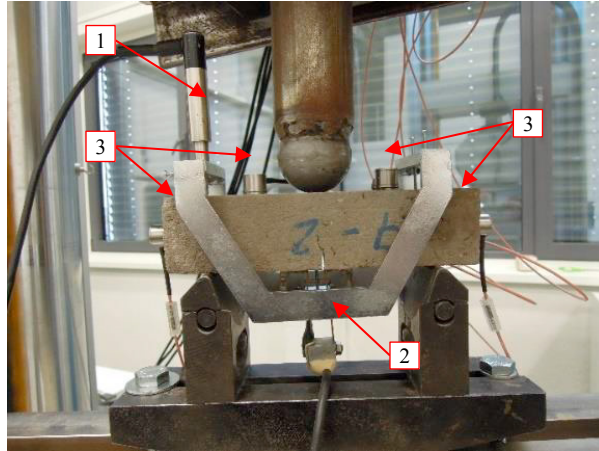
Fracture test configuration: detail of the specimen with position of sensors (1 – deflection sensor fixed in the measurement frame, 2 – extensometer, 3 – AE sensors).
